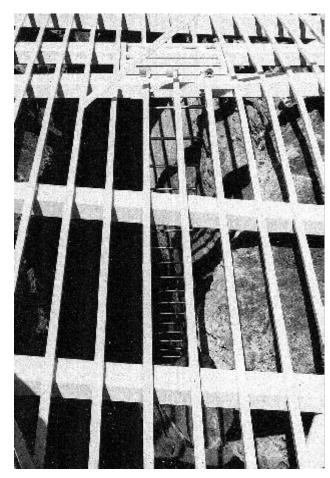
Partial view of the the entrance grid, looking down the entrance shaft. The access trap door and the suspended access ladder are visible.
